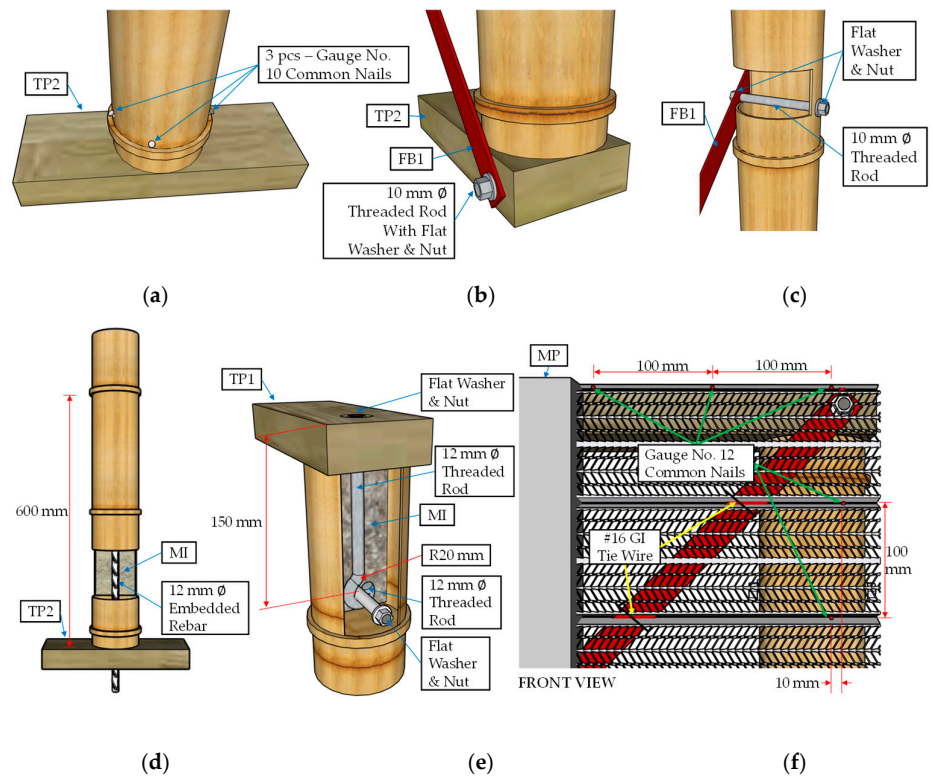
Various connections in the CBSW panel: (a) nailed connection between bamboo studs and timber plates; (b) bolt connection between flat bar and timber plates; (c) bolt connection between flat bar and bamboo studs; (d) embedded rebar connection; (e) J-bolt connection; (f) nailed connection between rib lath and framing components, and GI tie wire connection.
